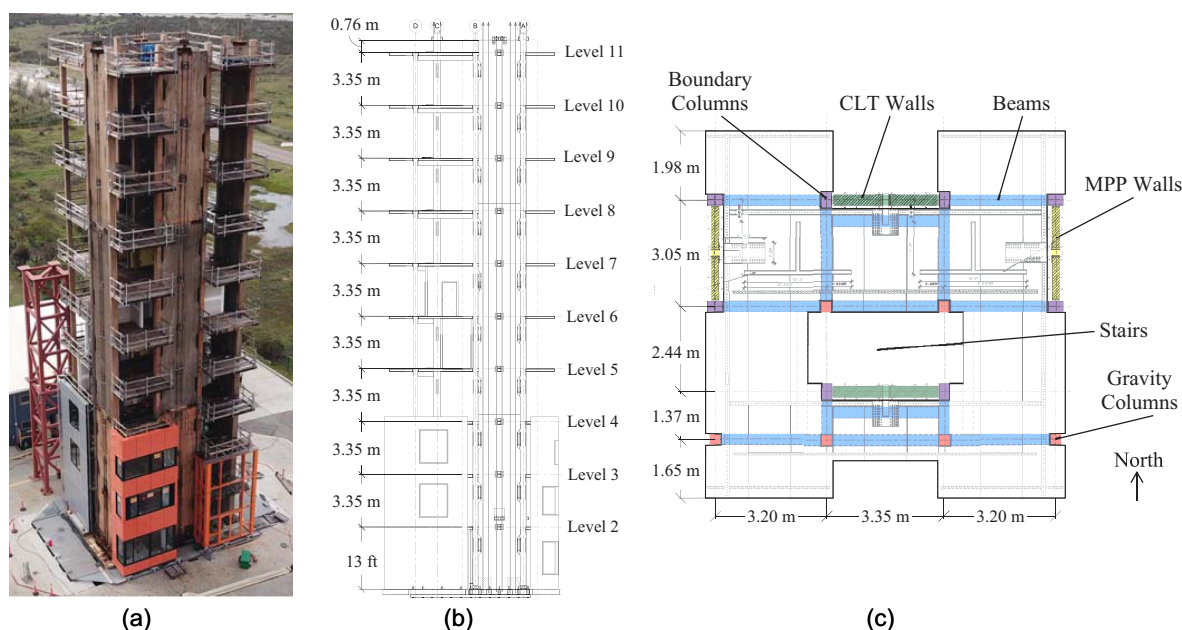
Ten-story test building specimen: (a) photo of completed building; (b) schematic elevation view; and (c) schematic of typical structural floor plan.
